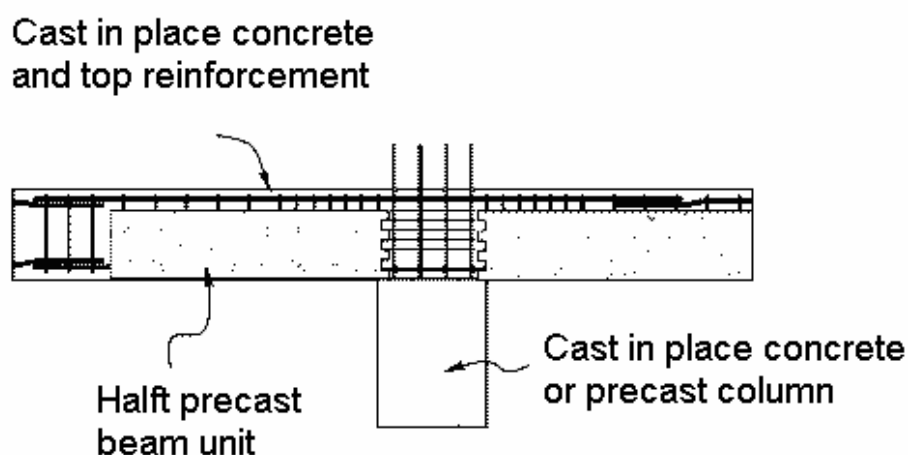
Connection, type emulated monolith R/C, using continuous bottom reinforcement
